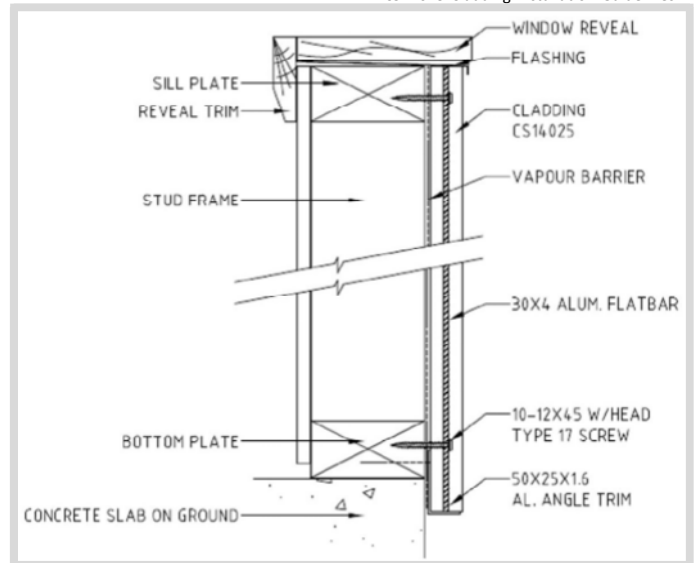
; Vertical Fixed Cladding – Typical Window Sill & Slab Edge Detail
